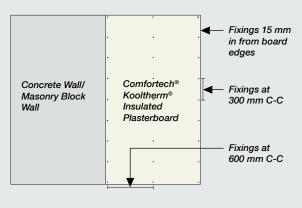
Comfortech[®] Kooltherm[®] Insulated Plasterboard adheres directly to masonry block wall surface.
